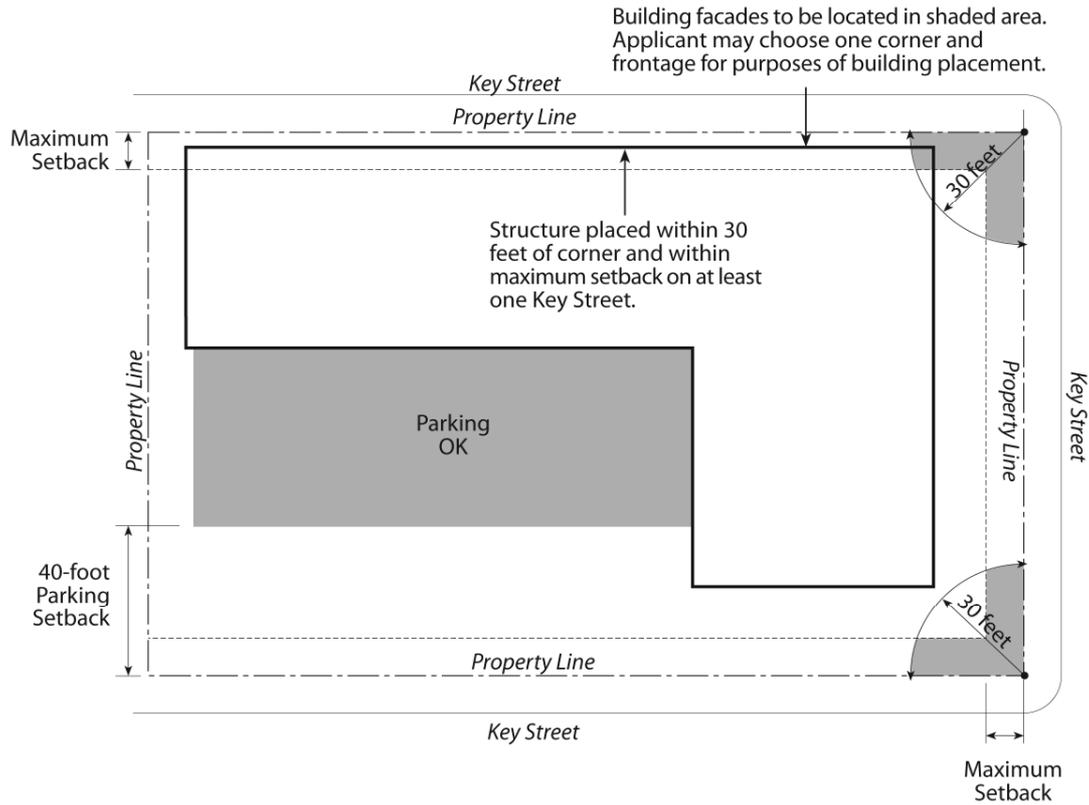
Building facade and parking placement on lots fronting two key streets
